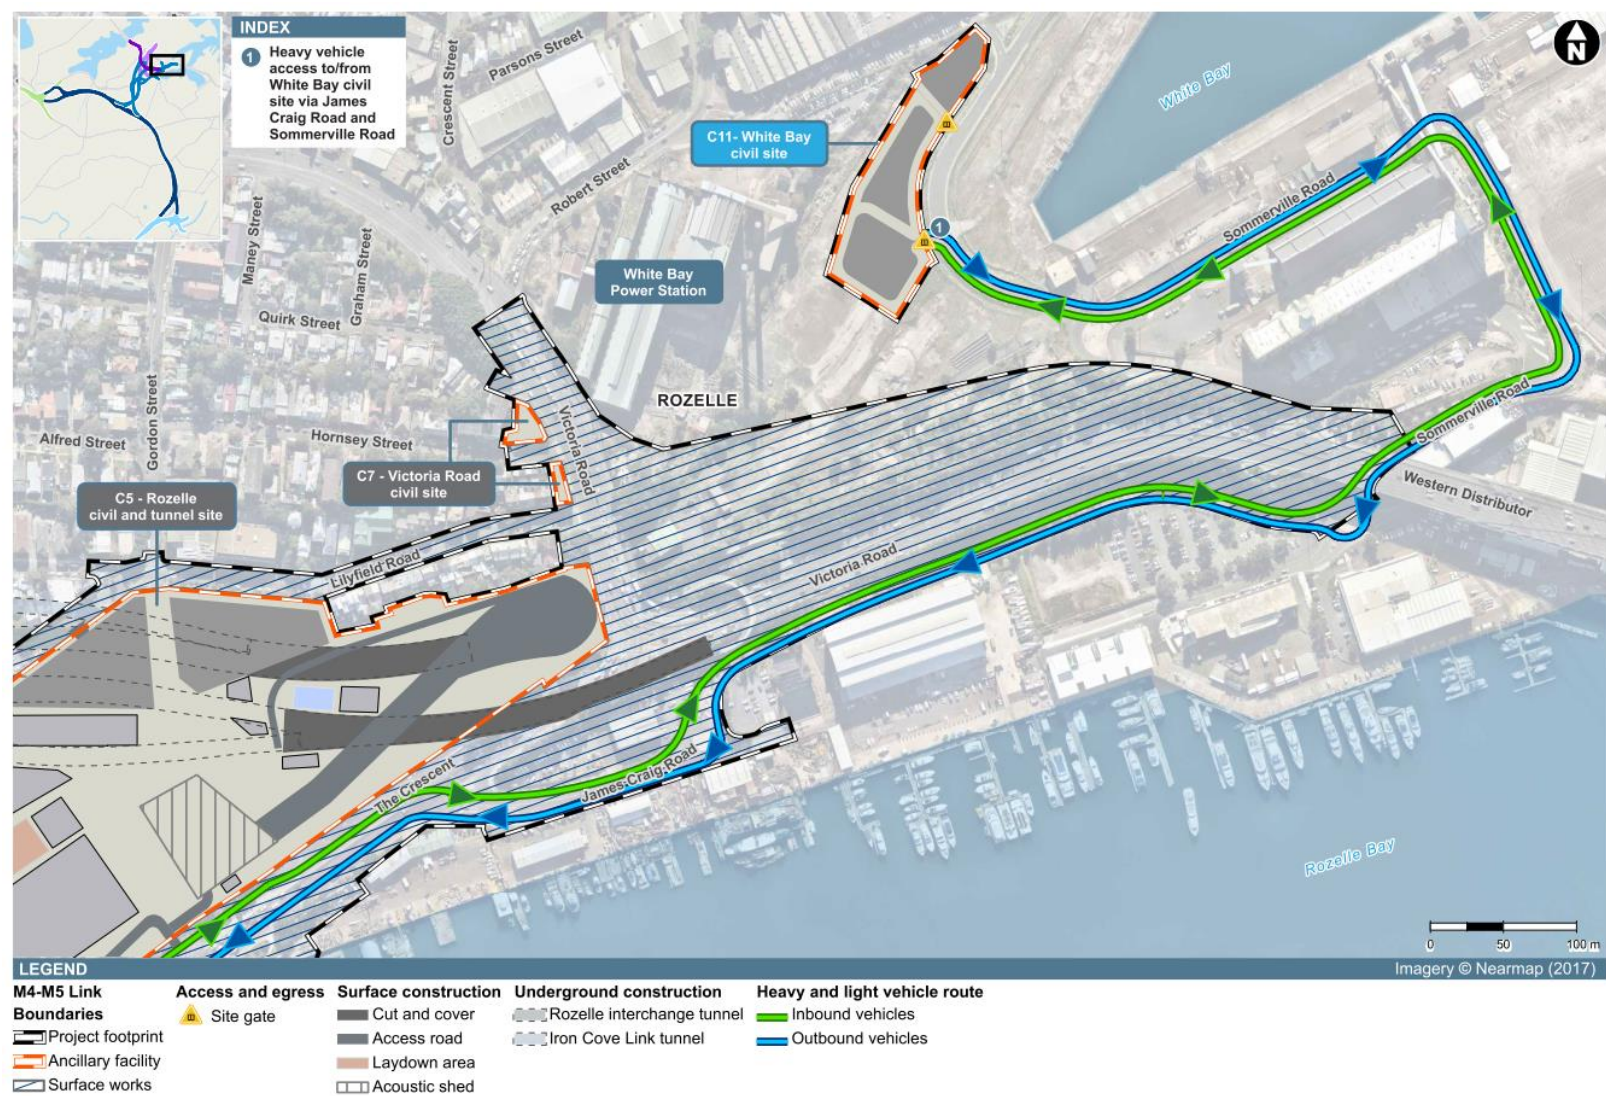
Indicative spoil haulage route – White Bay civil site (C11)
